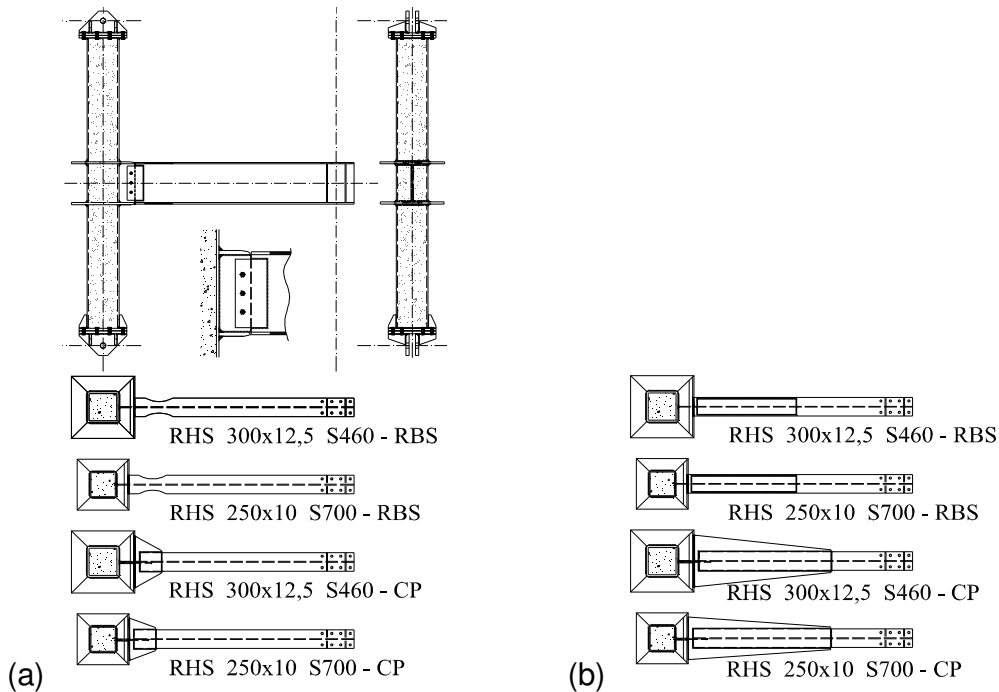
a) Configuration of the designed joint specimens, and b) the reinforced joints
